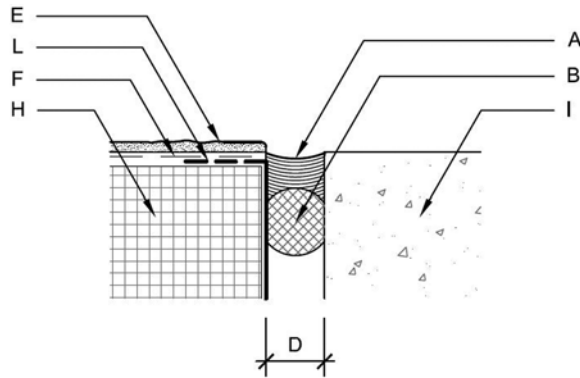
Sealant Butt Joint Seal (Accessory to Dissimilar Substrate)
